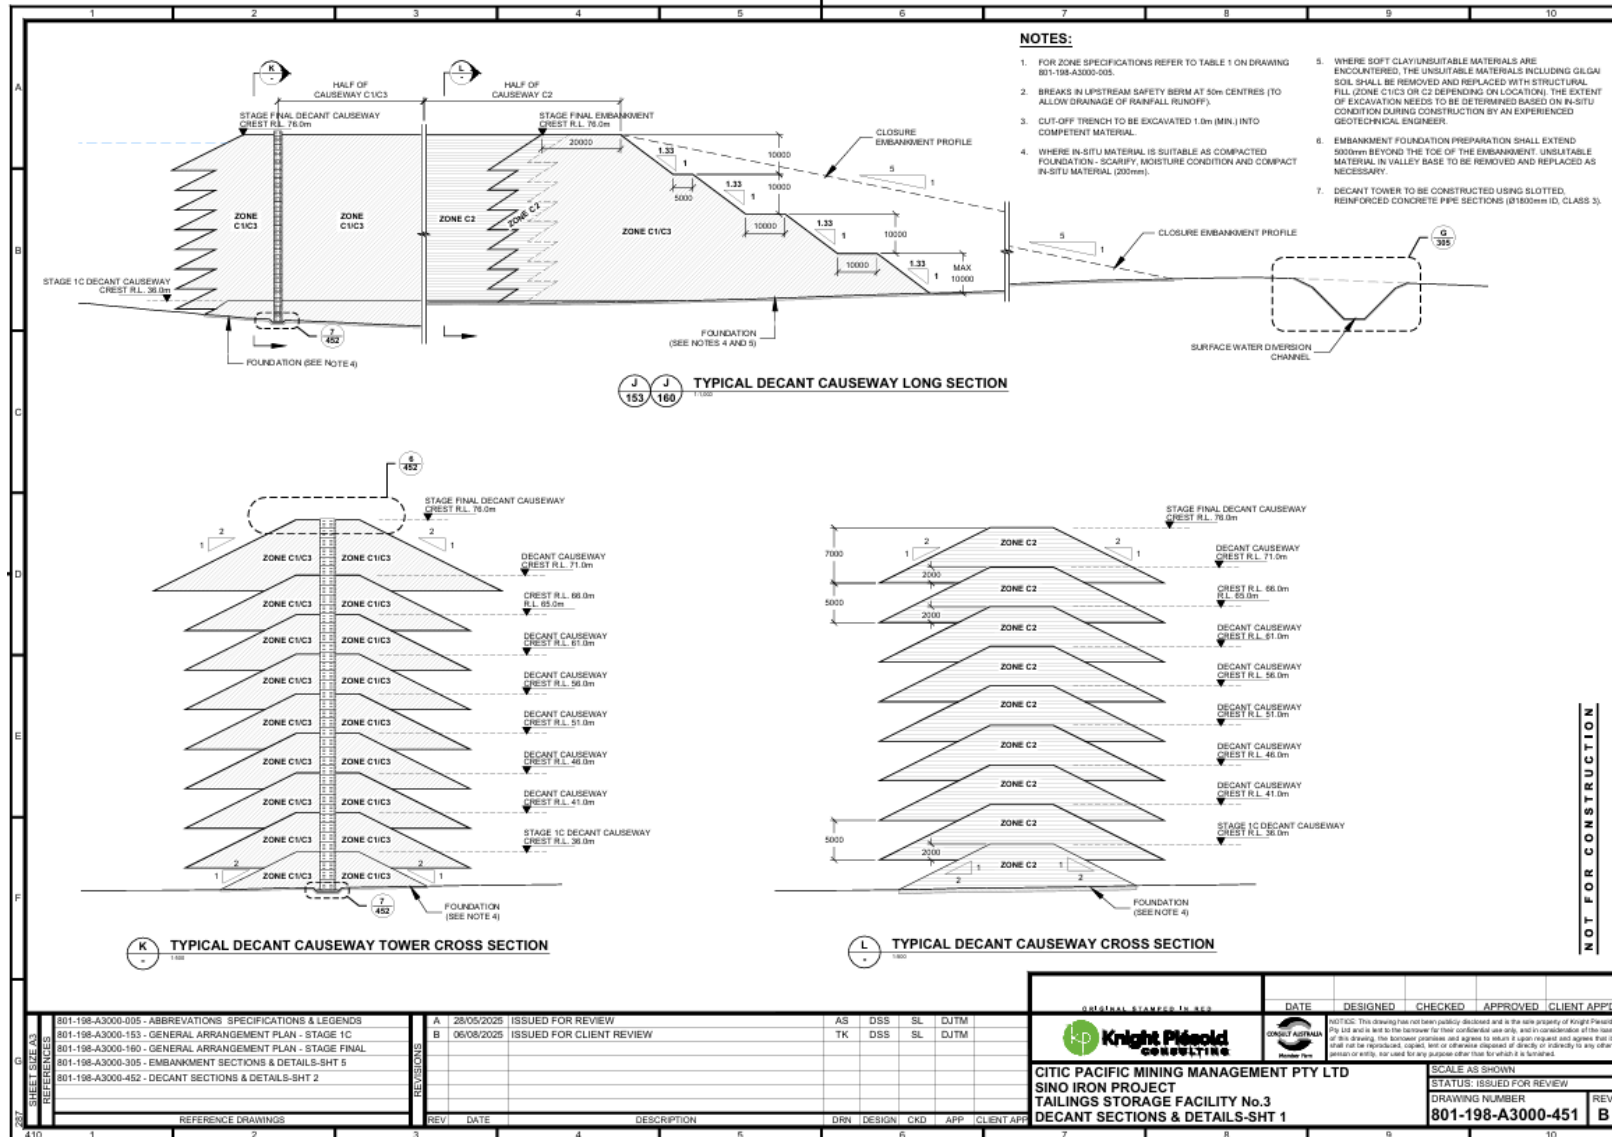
TSF 3 Decant causeway (relevant for Stage 1C)
